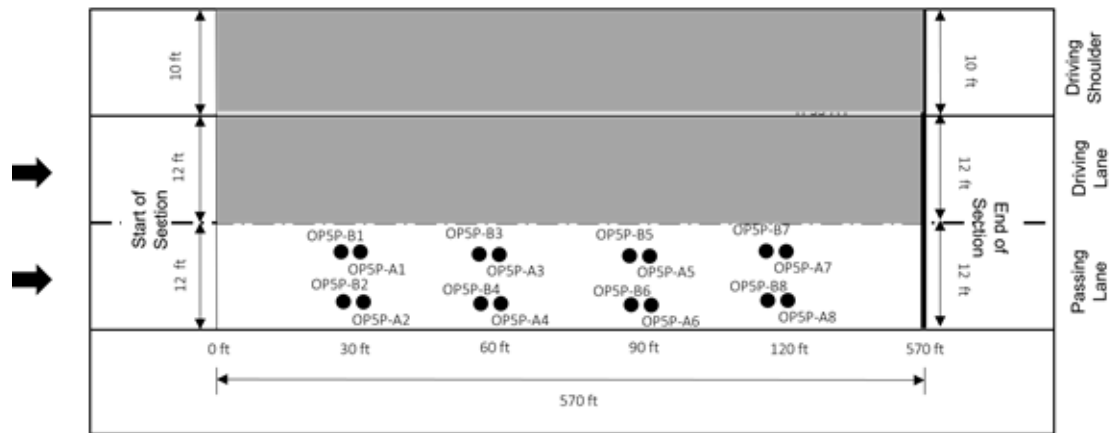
Cell 23 Sampling Plan (not to scale)
